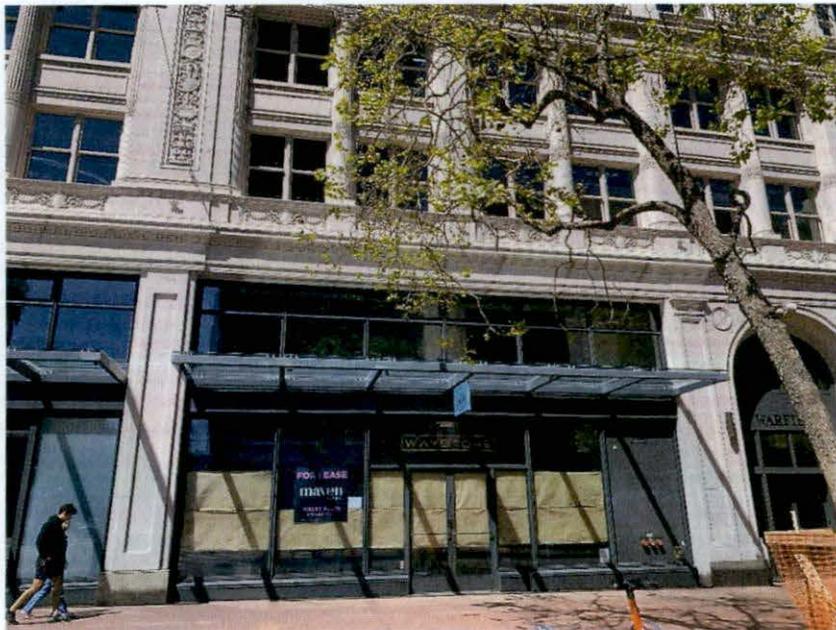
Photo D: View of granite wall base at ground level storefront entrance along Market Street elevation. Looking north.
